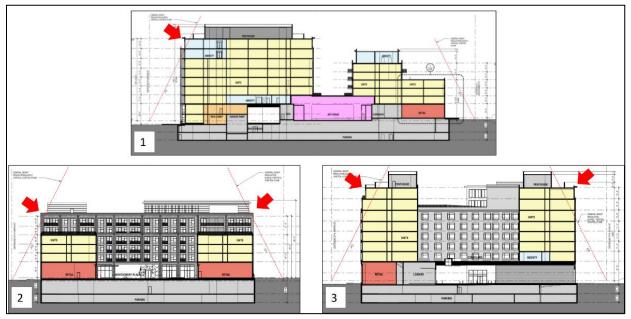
(1) N-S section through arts venue (2) E-W section through north building (3) E-W section through south building
